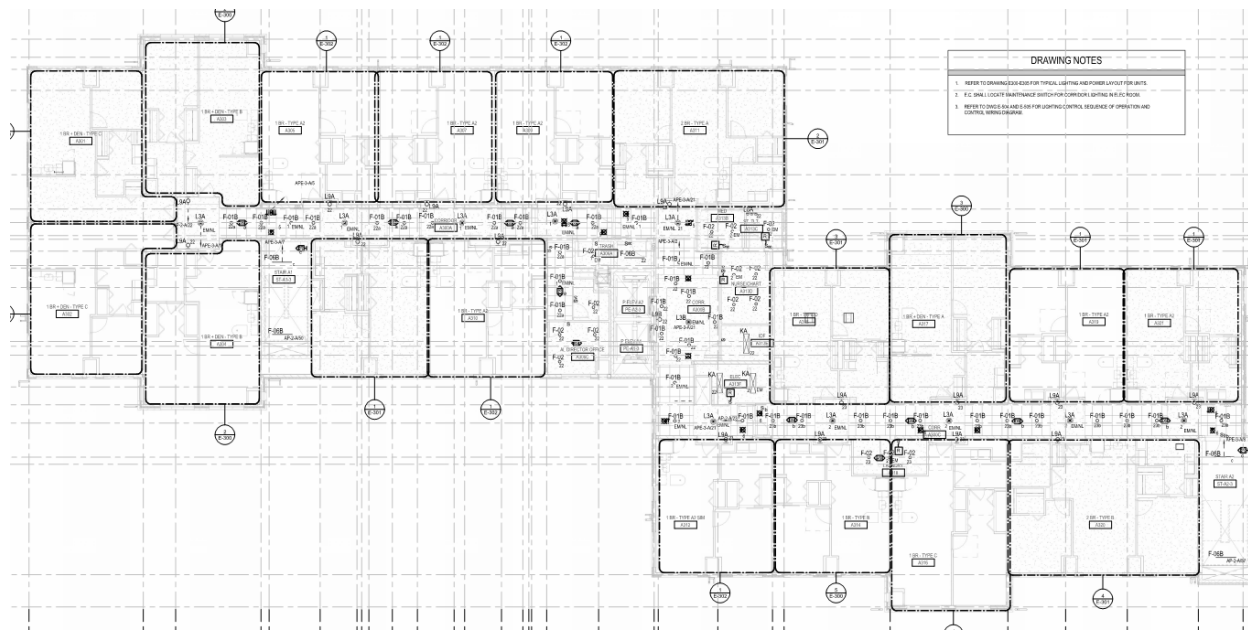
Drawing E-203A, Floor 3 lighting fixture layout, square footage same as level 2
